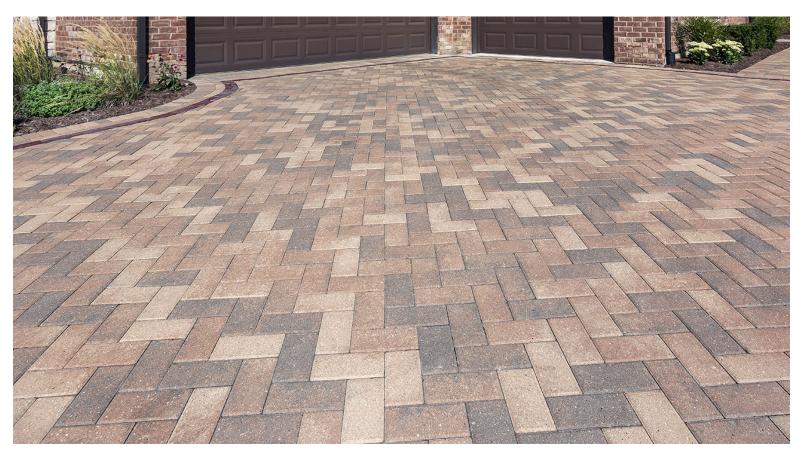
PROPOSED "HOLLAND STONE" UNIT PAVERS
